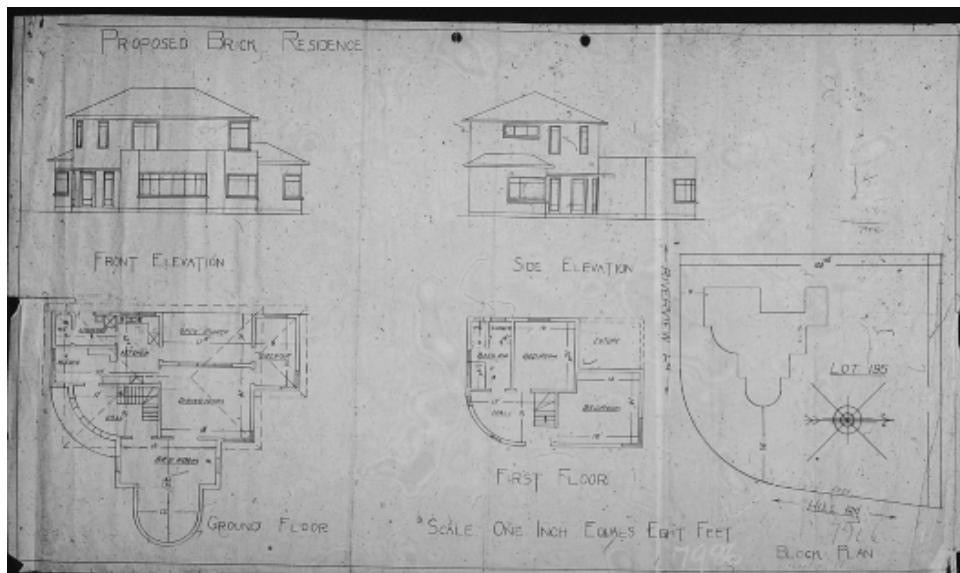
Architectural drawing of proposed brick residence. Note that drawing does not include the lower ground floor plan. (Source: BP 7986)
